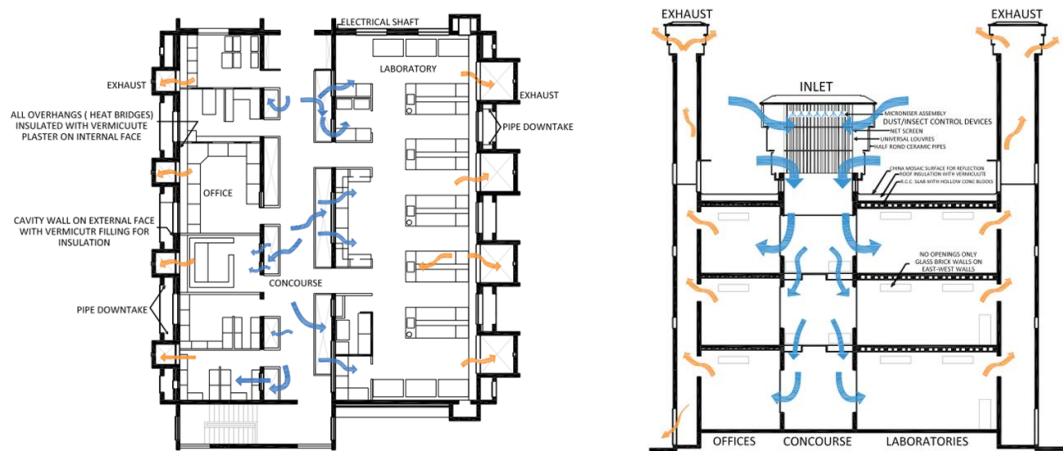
Floor plan of one of the PDEC buildings in the TRC (left), and section through the PDEC (right) showing the airflow strategy within the building (Thomas and Baird, 2006).
